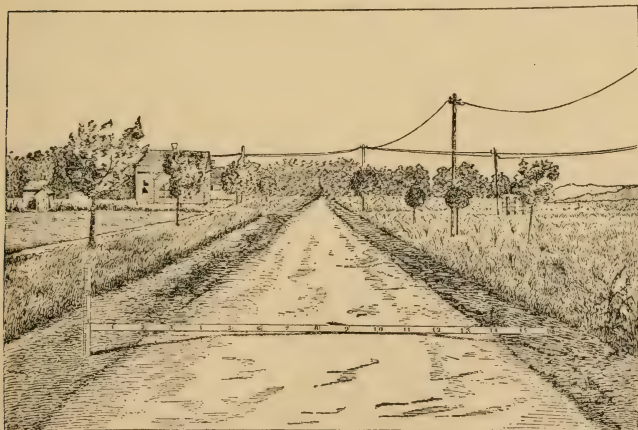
Properly Crowned and Well-Drained Earth Road. Note slope from center to sides. Road was 'worked with road machine and horse roller in March. Photograph taken June 1, about forty-eight hours after long, hard rain.
